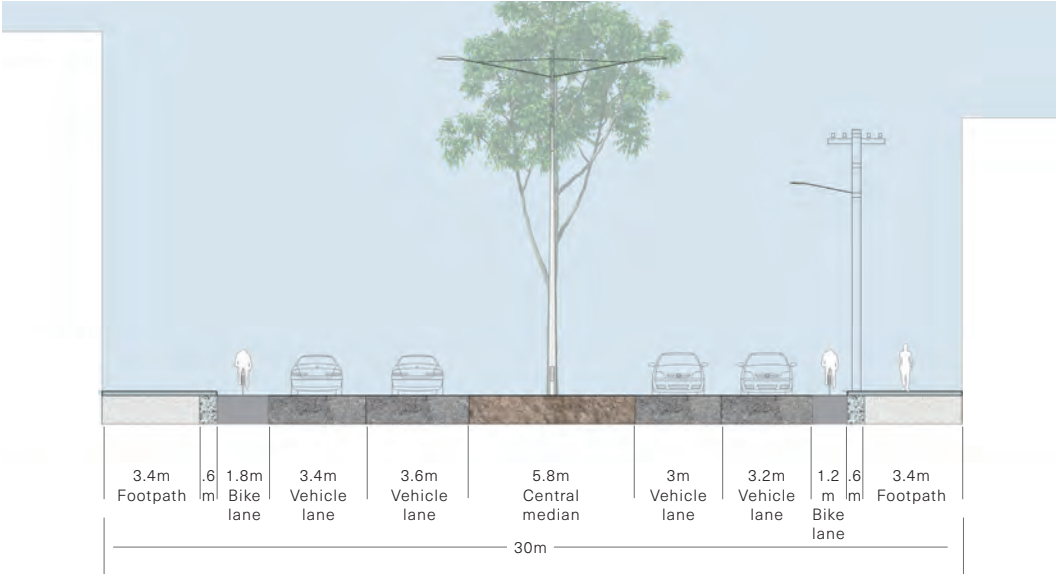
Section A-A' of Mercer Street central block showing the existing condition
